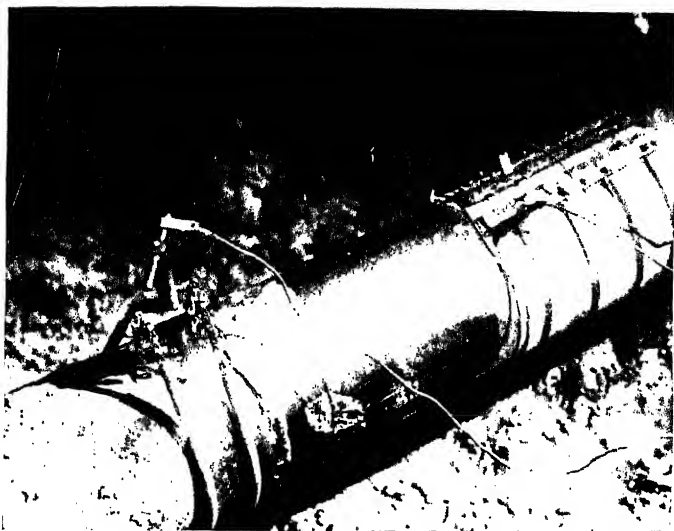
Setup for making pattern and resistance tests of pipe coatings.
